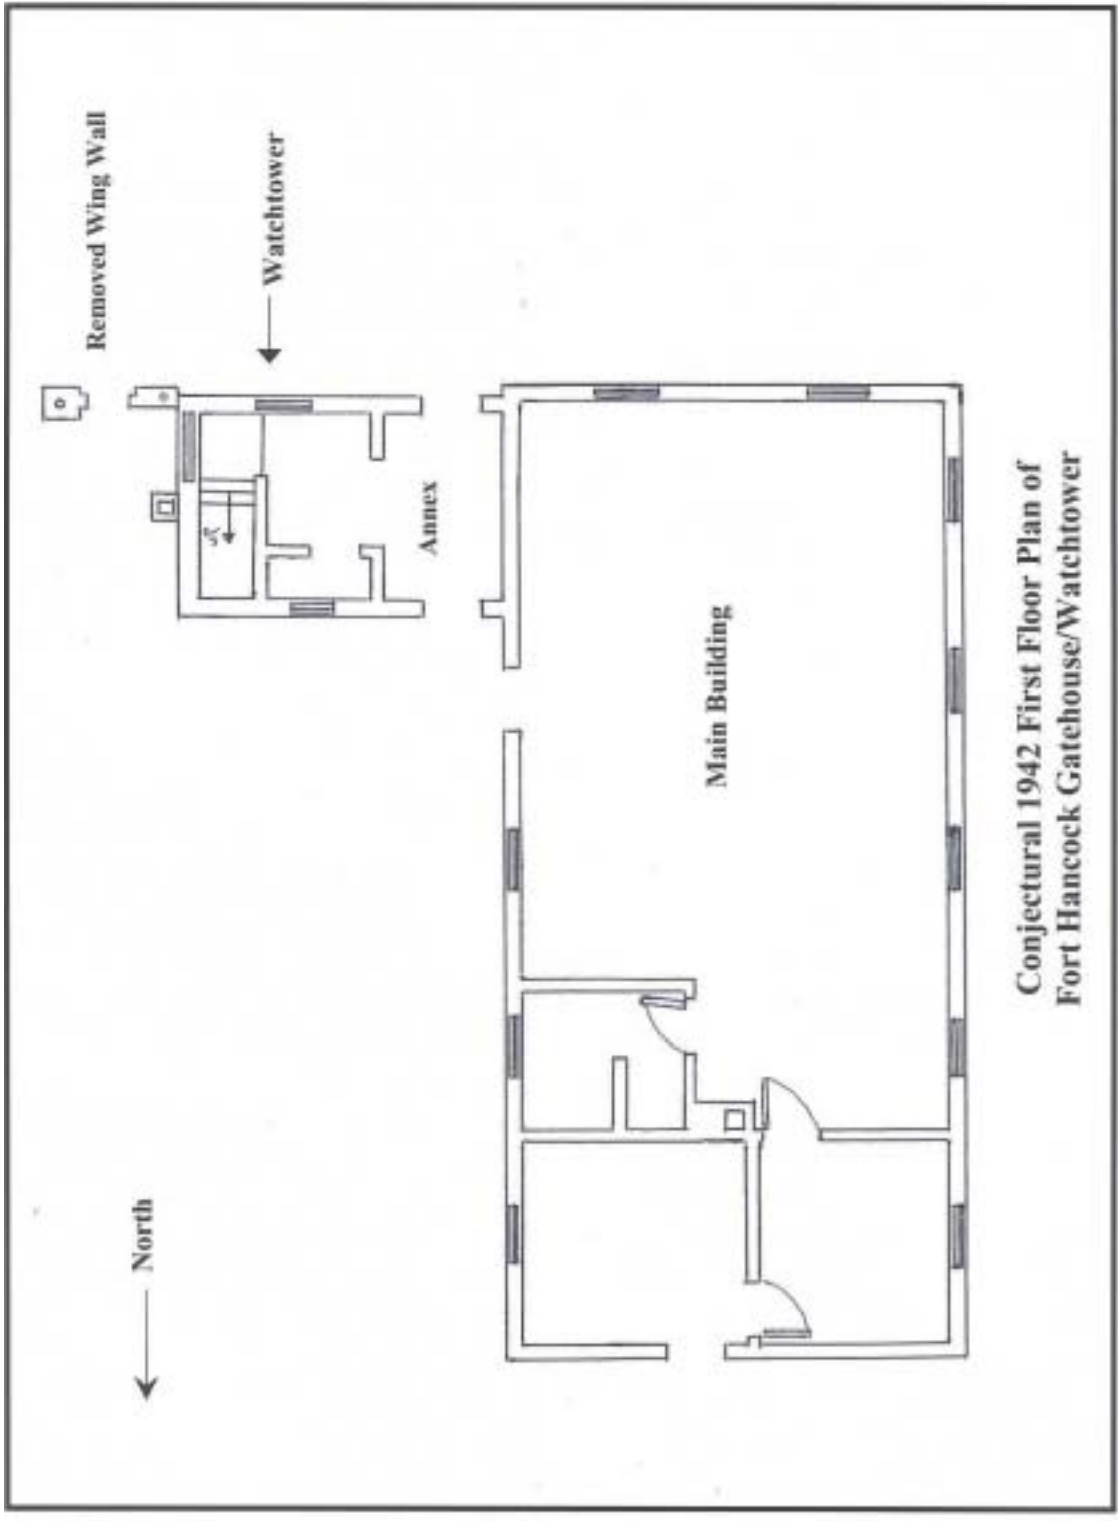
Conjectural drawing of original first-floor plan of Gatehouse/Watchtower based on a physical investigation of the building's existing architectural fabric.
